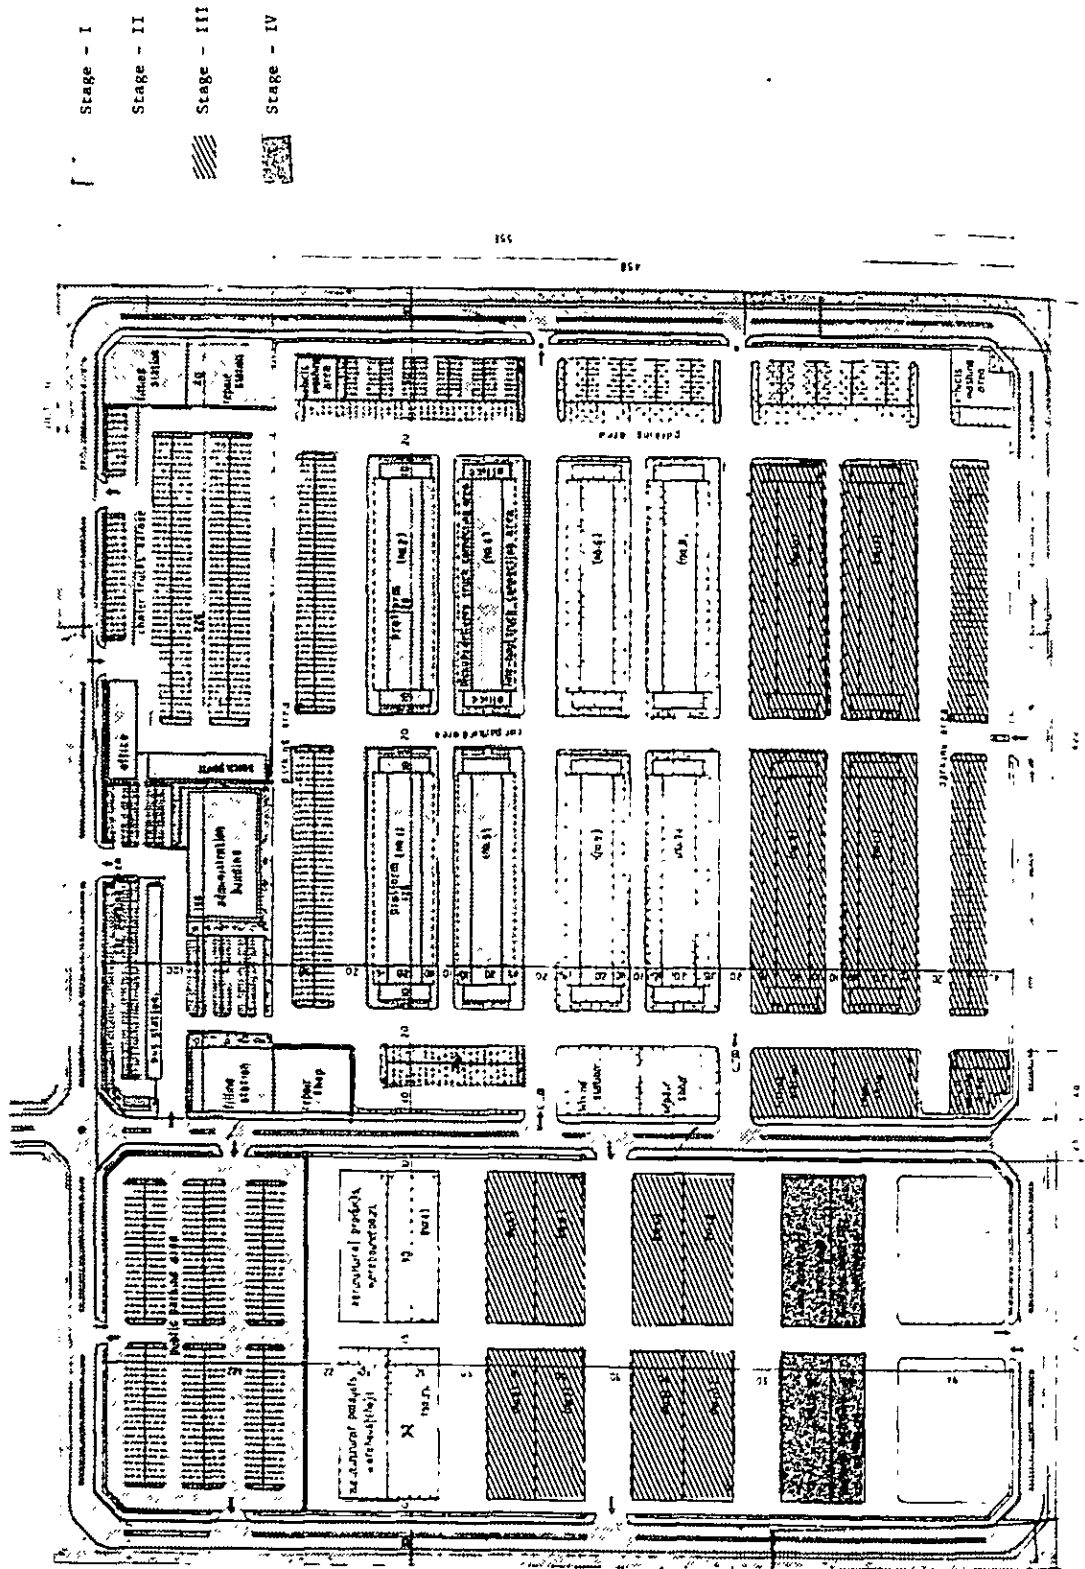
CONSTRUCTION STAGES FOR TERMINAL-C (Alt. 7)
